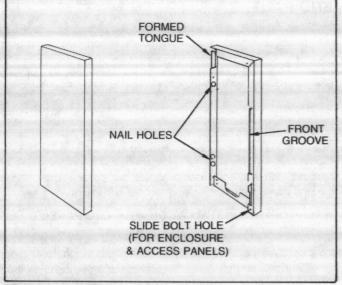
Wall-to-Wall Installation with End Panels (Front View)
